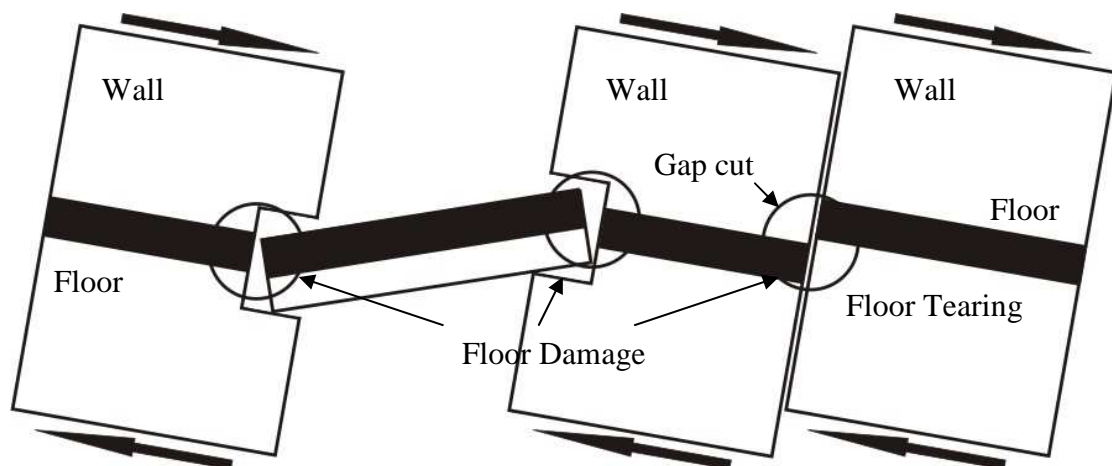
Floor damage due to wall lateral displacement
